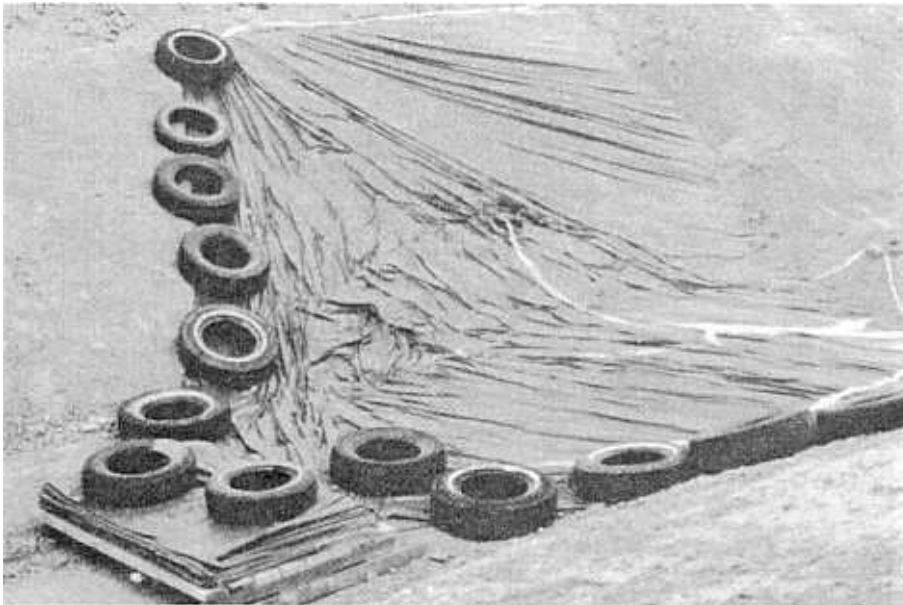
View of contractor's method of installing PVC geomembrane on Amarillo Canal, Navajo Indian Irrigation Project, New Mexico. Lining was delivered to job site accordion-folded and on pallets. The rubber tires are used to temporarily anchor the lining until earth cover is placed.
